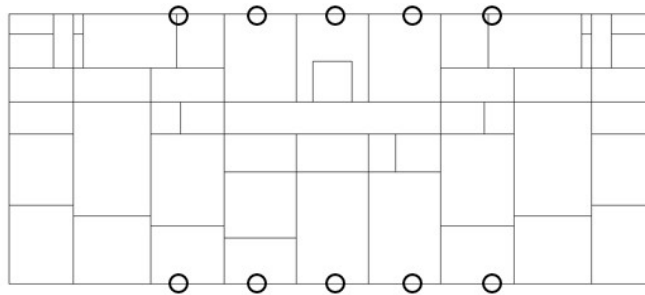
Damper Placement at roof floor (SR-X); MSSSA: 10 dampers
